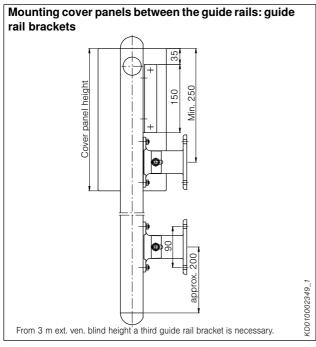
Position of the guide rail bracket for mounting cover panels between the guide rails
